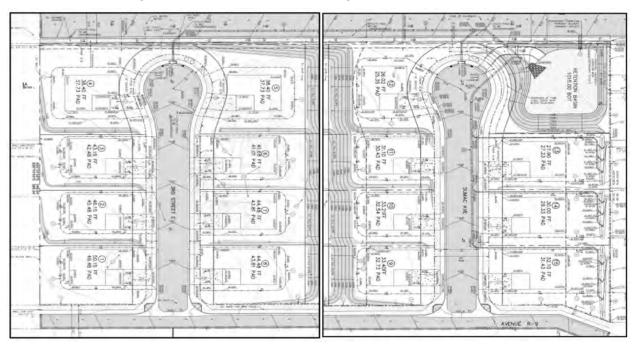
Site Plan – Proposed Housing Development - Palmdale, CA
